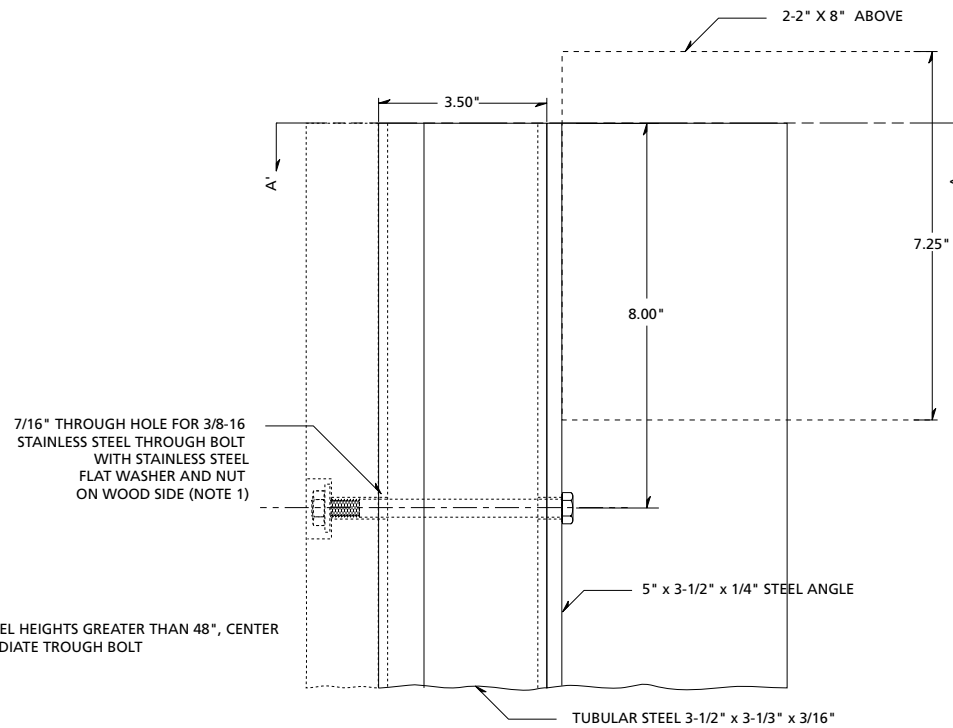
DETAIL POST ASSEMBLY 3-1/2" x 3-1/2" x 3/16" FRONT ELEVATION
